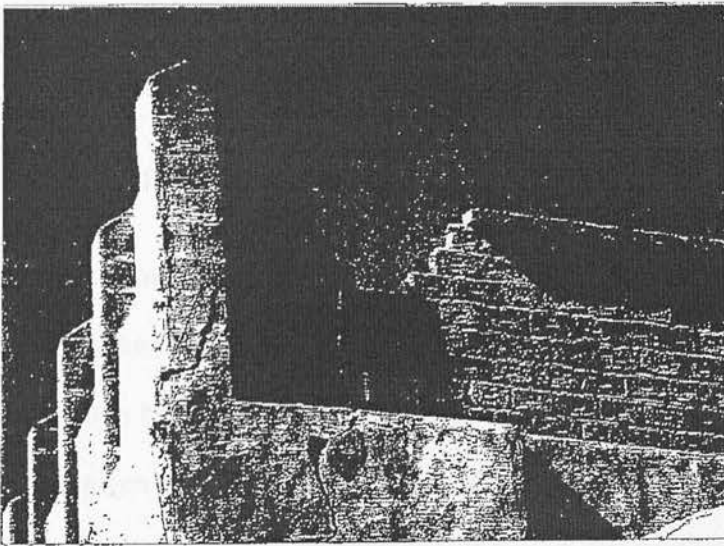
A parapet design in an old Kuwaiti house designed for security and privacy and providing ventilation
